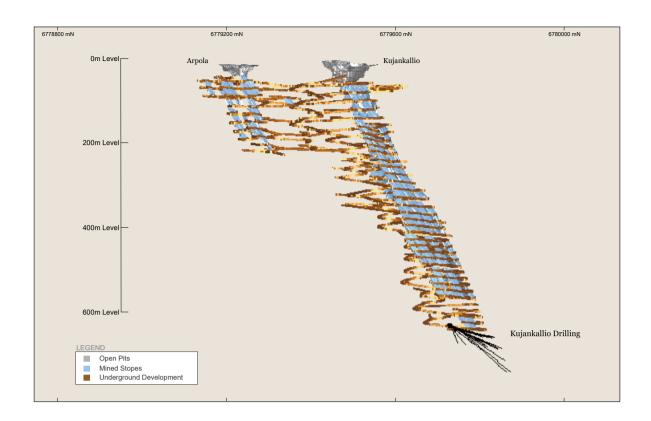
Jokisivu Gold Mine with 2023 Kujankallio Drilling Campaign. View looking west.
